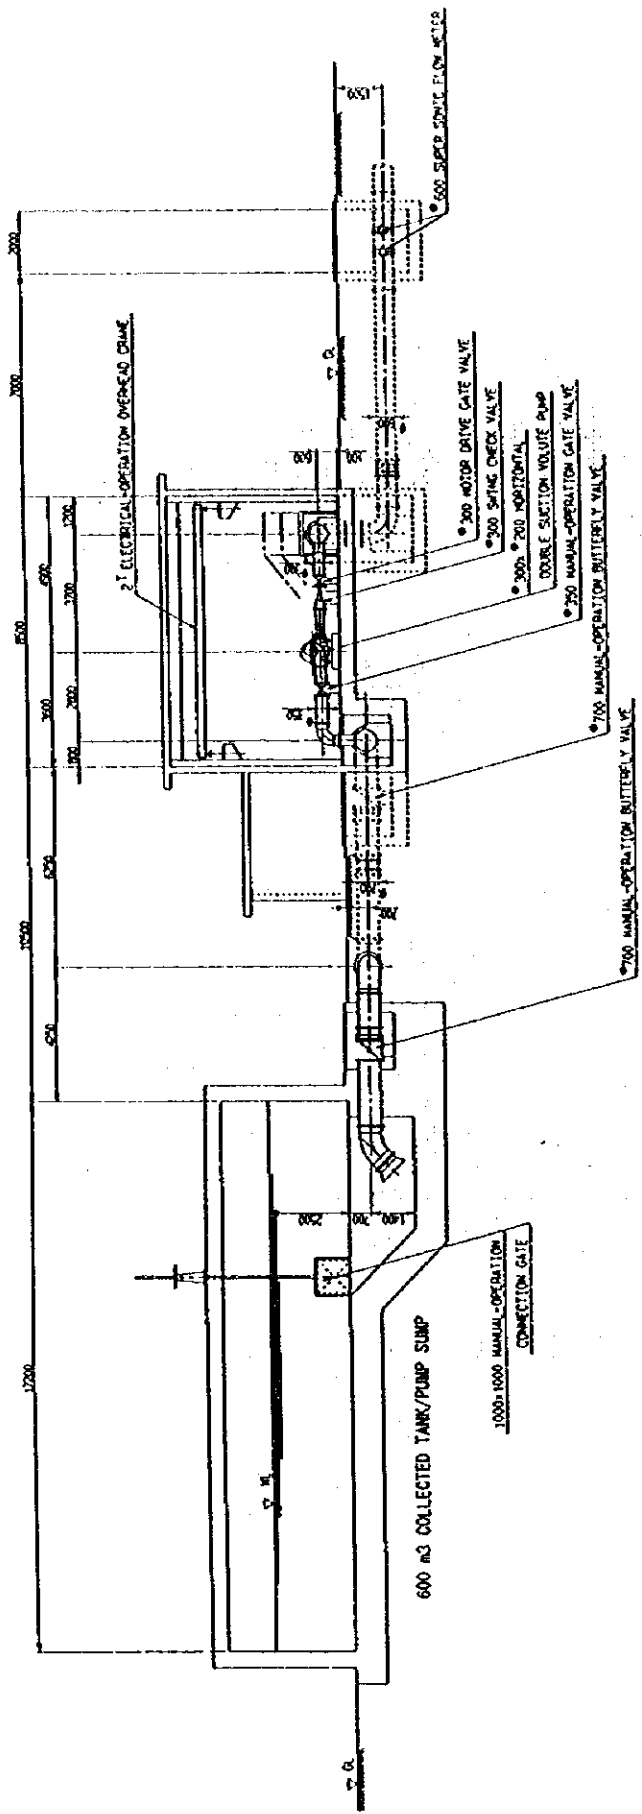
(1) Plan of Pump Station (Plan1) (1/3)
